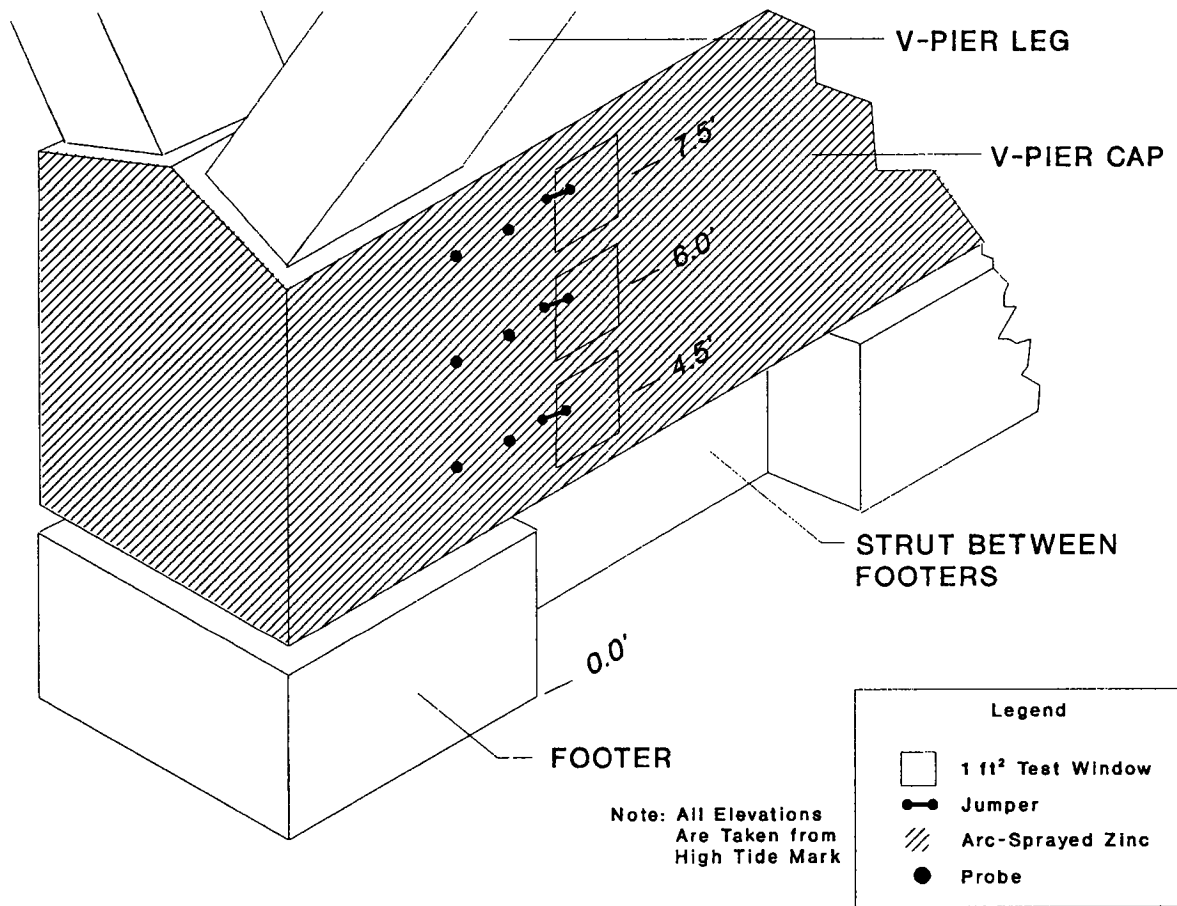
Schematic of test site at Long Key Bridge (1 in. = 2.54 cm; 1 ft = 30.5 cm)
